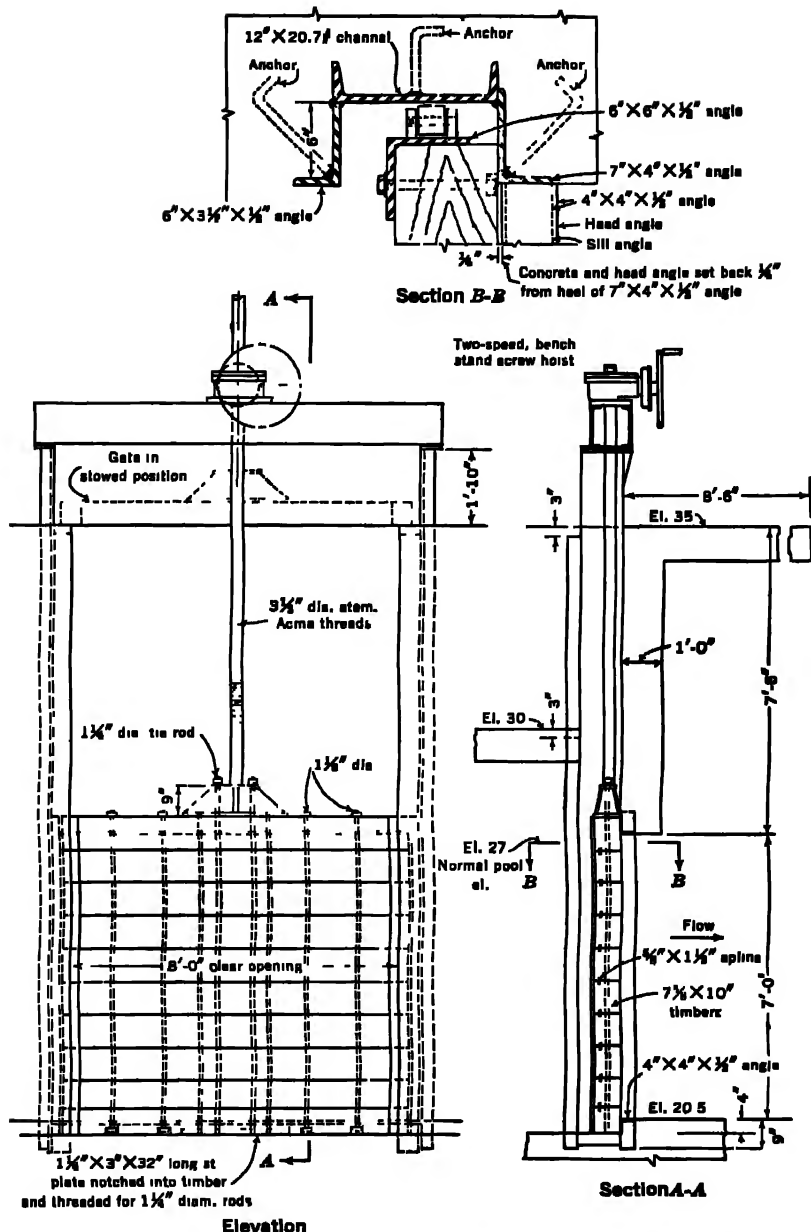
Timber head gate. Union Lake Dam, Millville, N. J. (Millville Manufacturing Co.)
